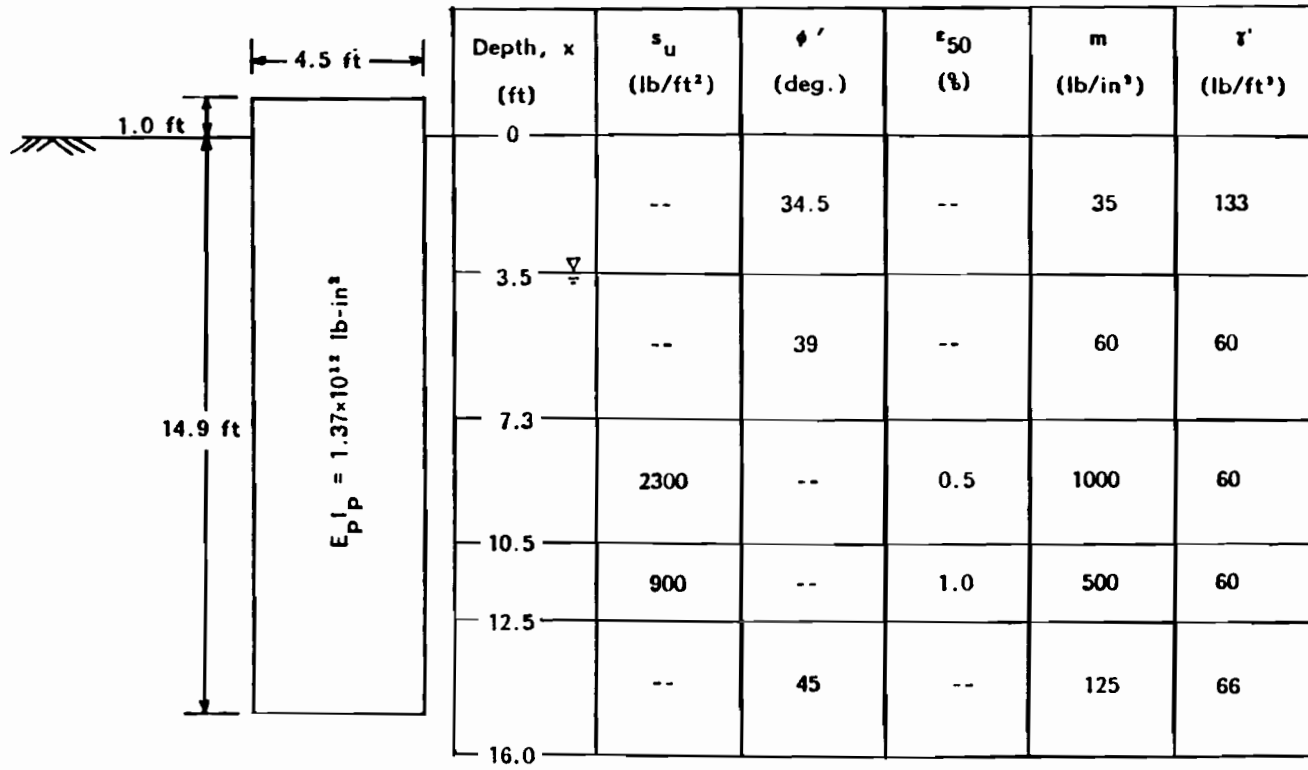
Soil and Drilled Shaft Data Used for COM624 Input, Shaft No. 6.
